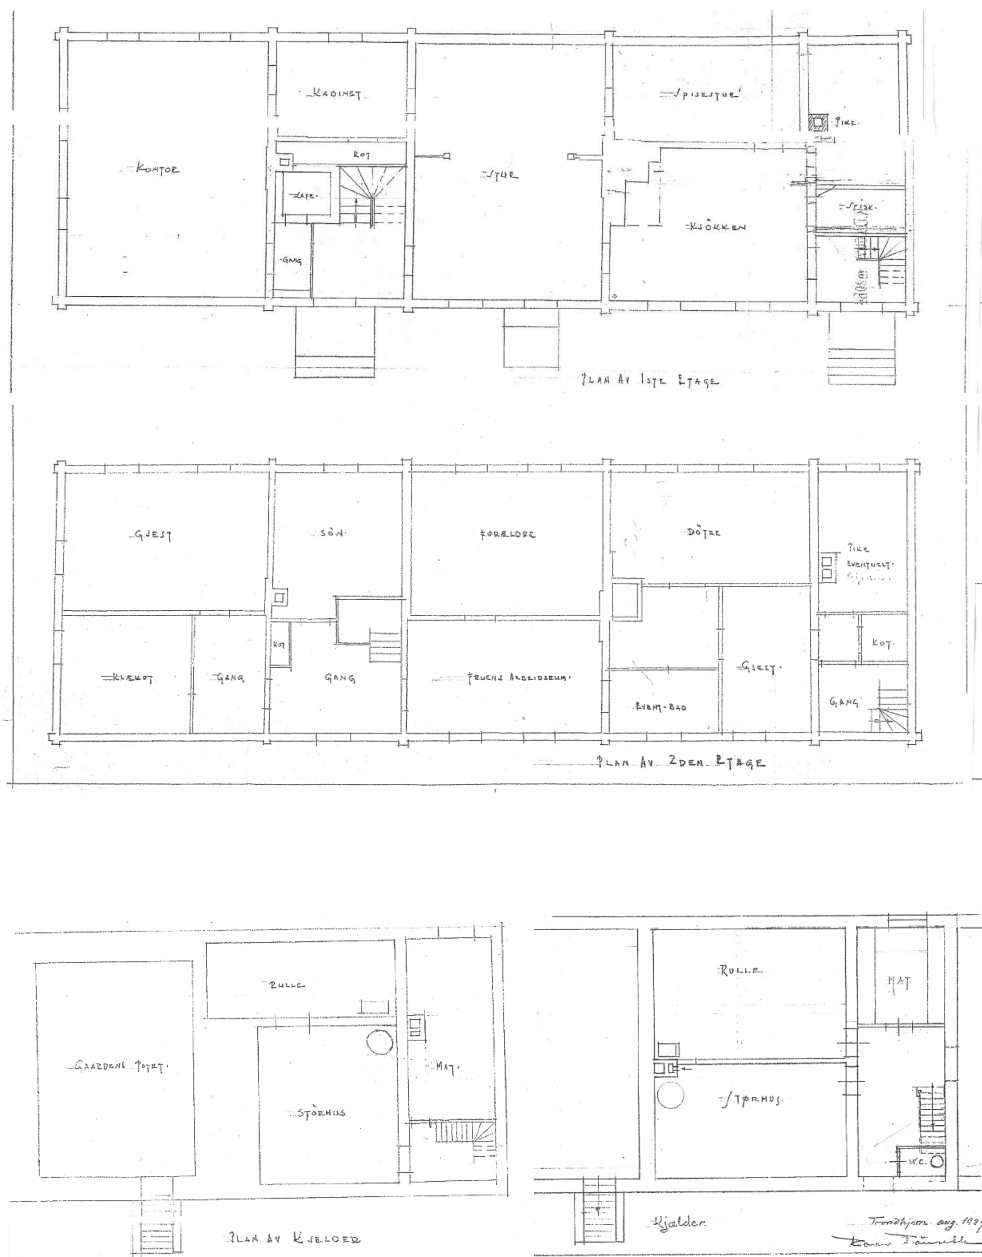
Prestegårdslåna, reduced restoration plan excluding the west end by Roar Tønseth, 1929 (top); plan for the basement (bottom) which shows the existing potato storage and the new rooms (left) and alternative plan for new basement with an extended potato cellar and new foundations for the entire section (right). (R. Tønseth, August 1929. From Prestegårdslåna's archive, reproduced courtesy of Stiftelsen Prestegårdslåna)
